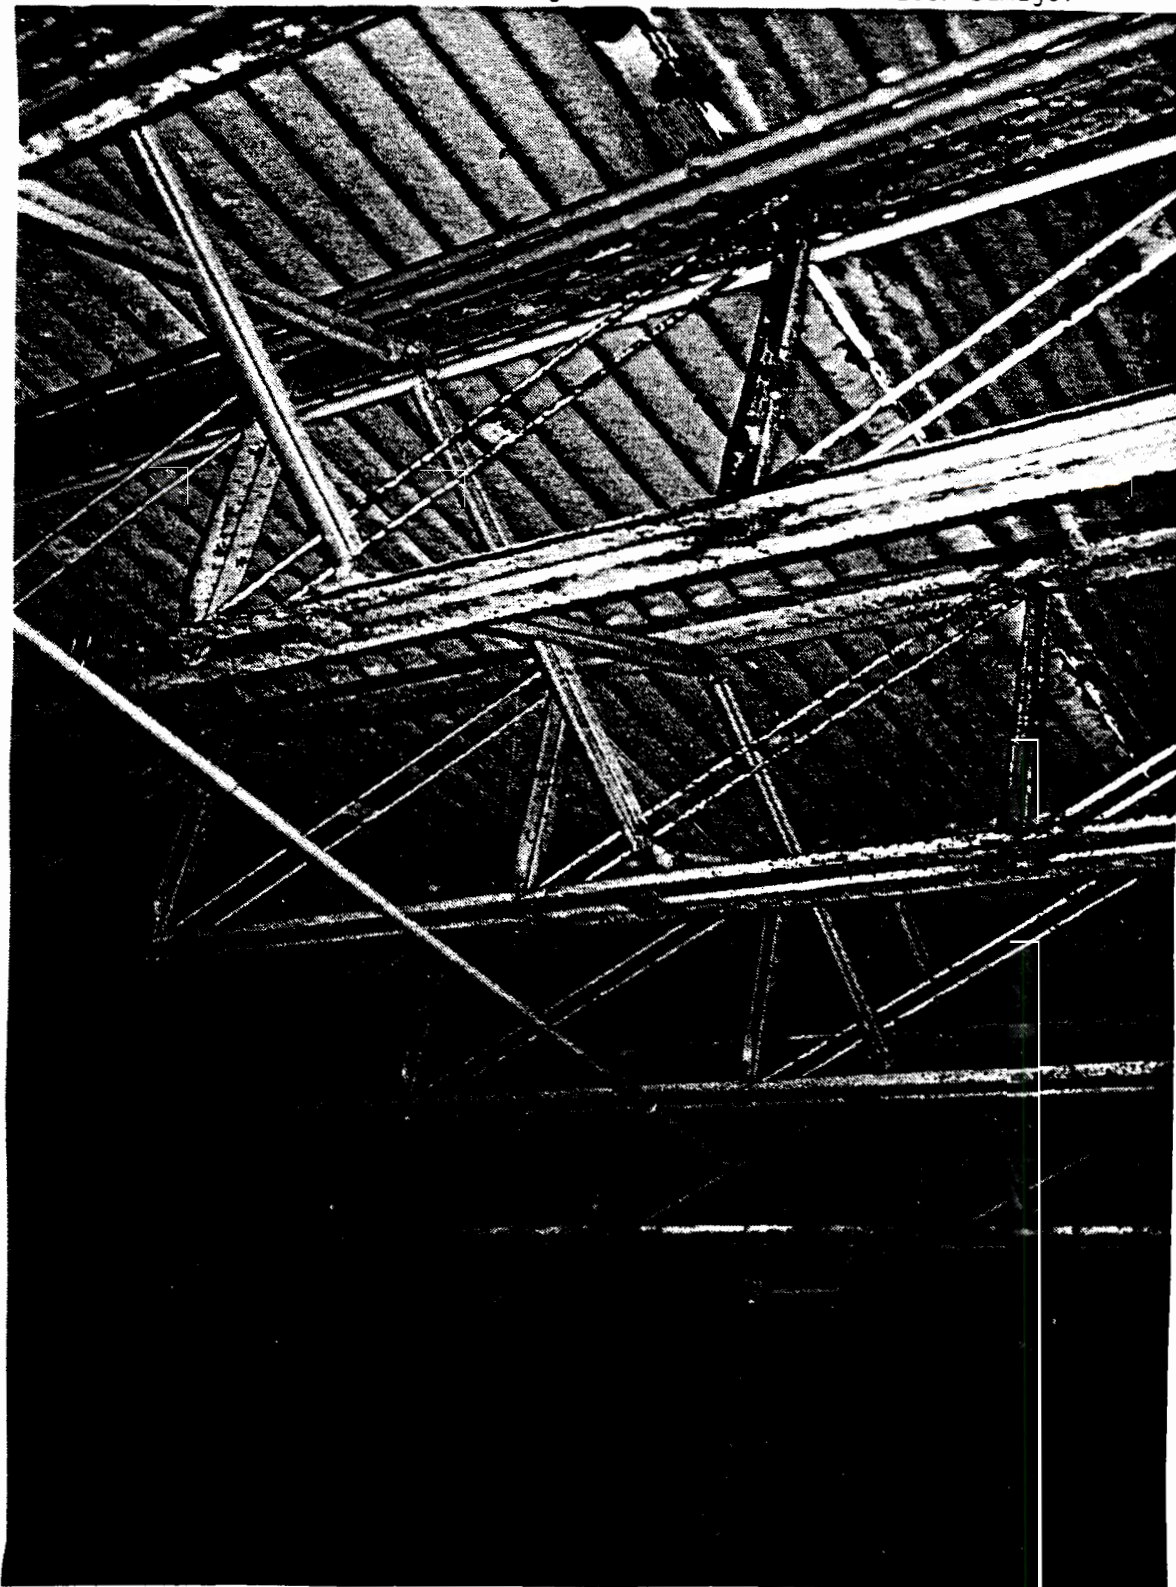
183-C Building Roof Damage Caused by Wind.
